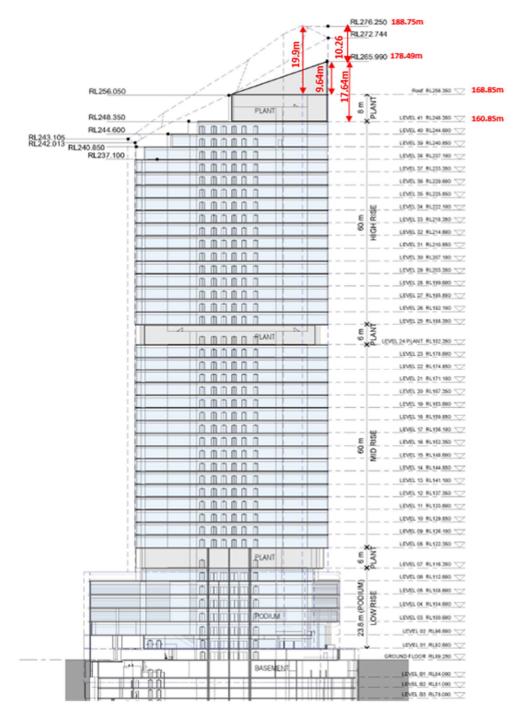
Indicative Section Plan (Applicant's Urban Design Report, p.80). Note. The maximum building height has been measured from the lowest point of the site, which is RL 87.5 as noted on the Ground Level Floor Plan on p.65 and 66 of the Applicant's Urban Design Report.
